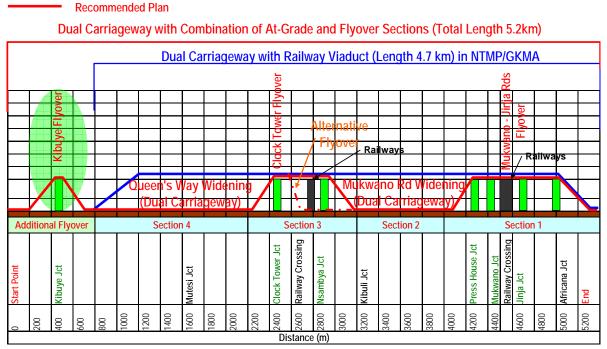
Alternative Plan (Profile) for Dual Carriageway with Railway Viaduct Plan
